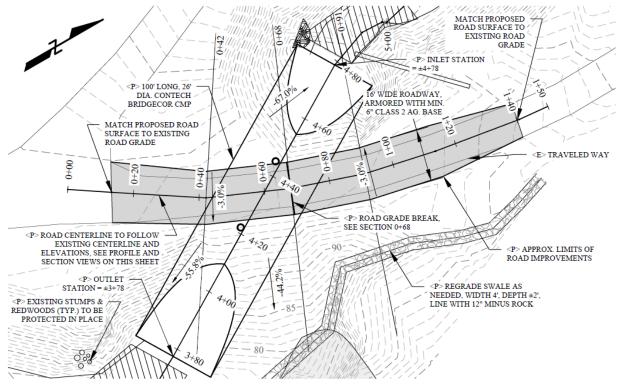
Plan view of proposed culvert and Chamberlain Road improvements (Appendix A, Sheet 6)
